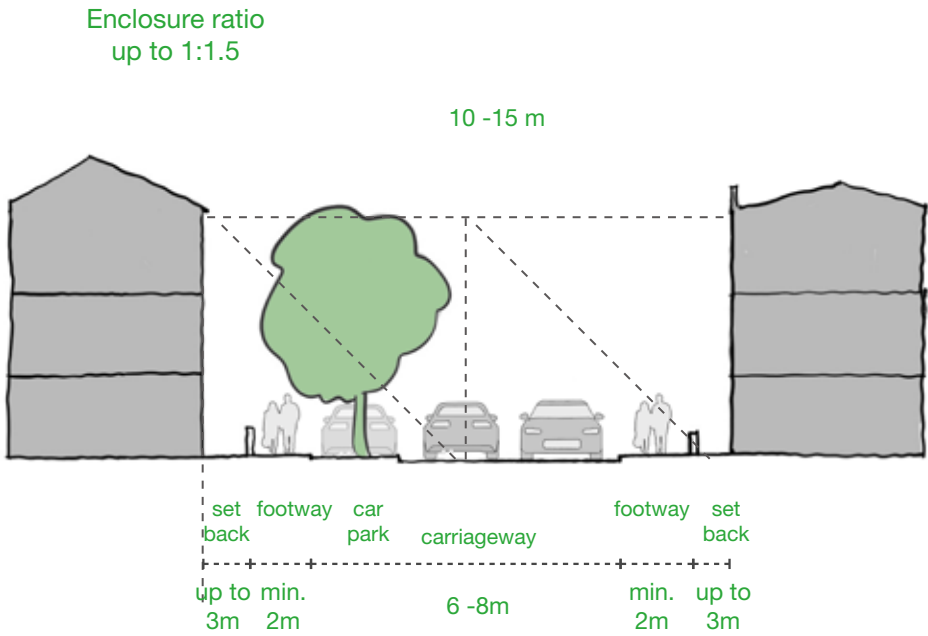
Typical street section of urban street with traffic in Lichfield City Centre area
